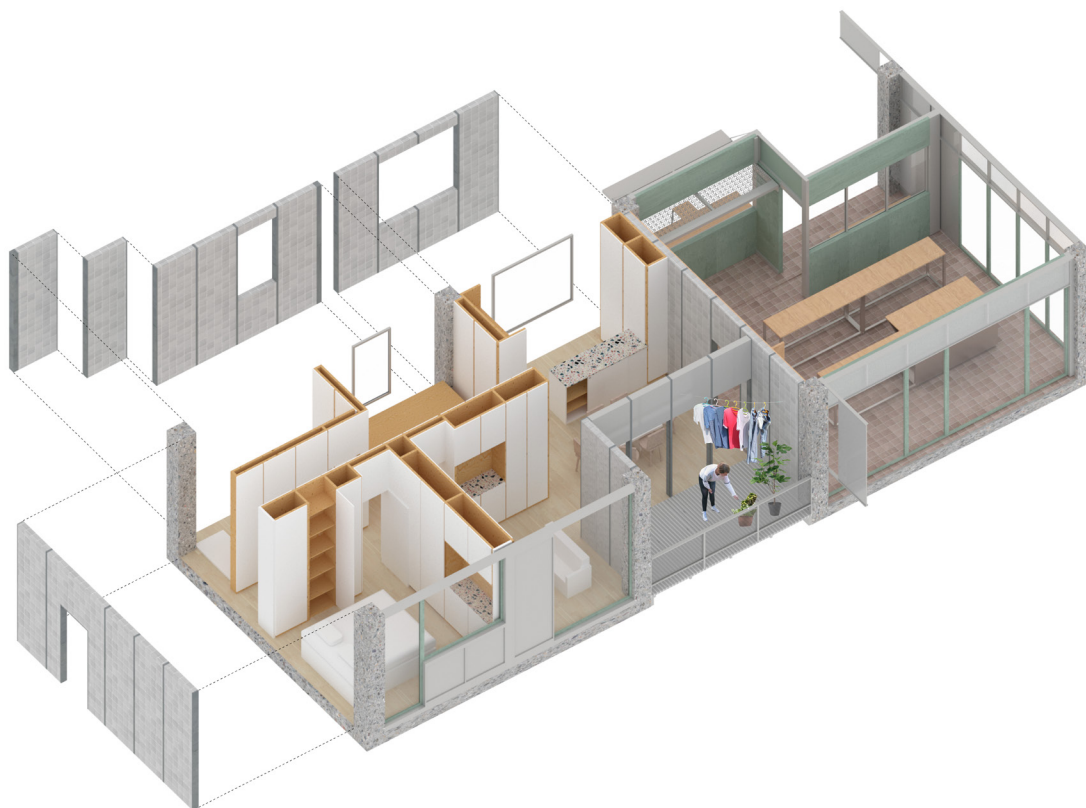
Exploded diagram showing how the panel modules can be used to construct the courtyard facing facade of the dwelling units.
